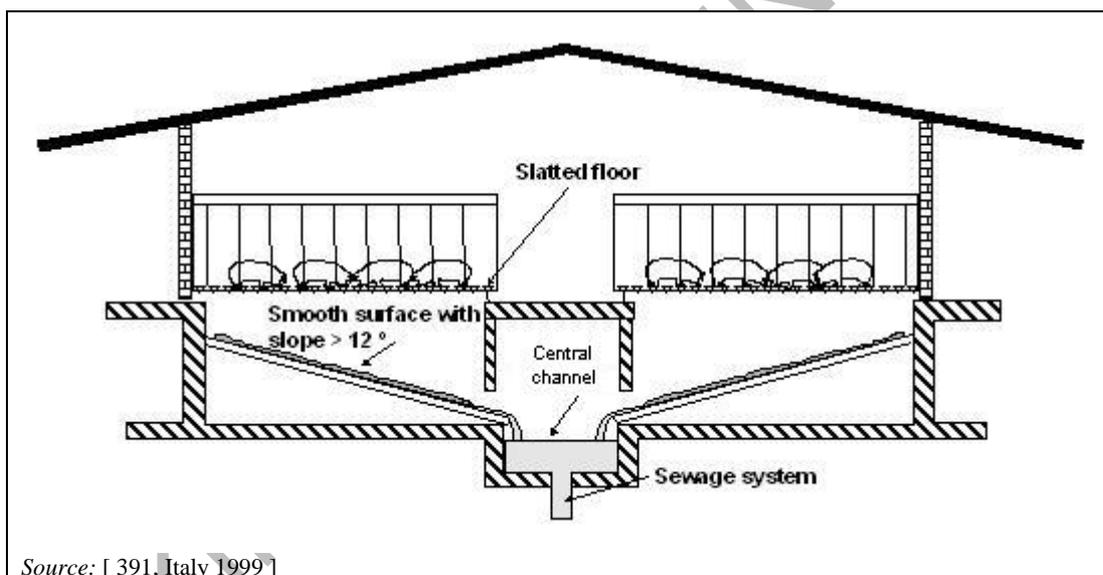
Flat decks or pens with concrete sloping sloped underground floor underneath to separate faeces from and urine
